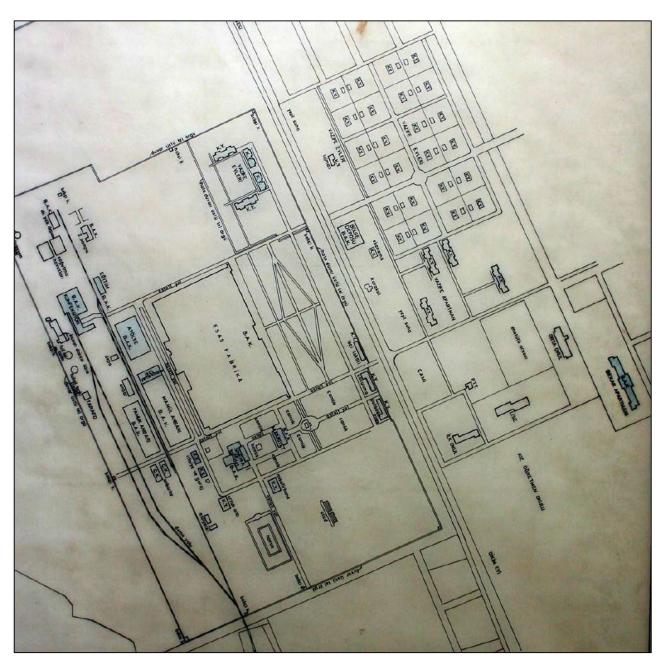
Sümerbank Textile Factory Site Plan (Source: Burak Asıliskender Archive)
